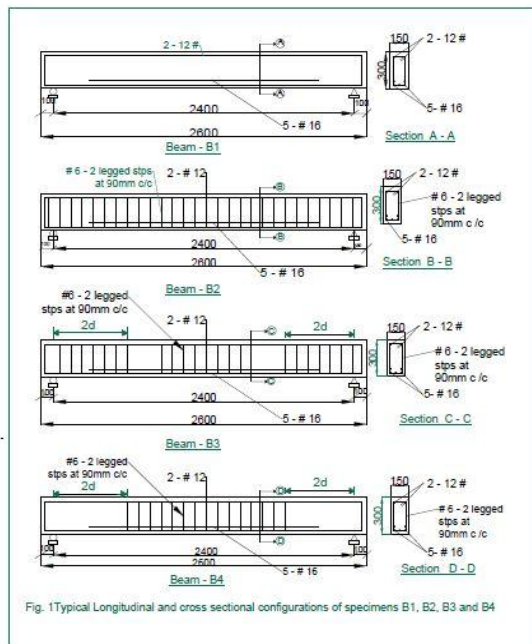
Typical Longitudinal and cross sectional configurations of specimens B1, B2, B3 and B4
